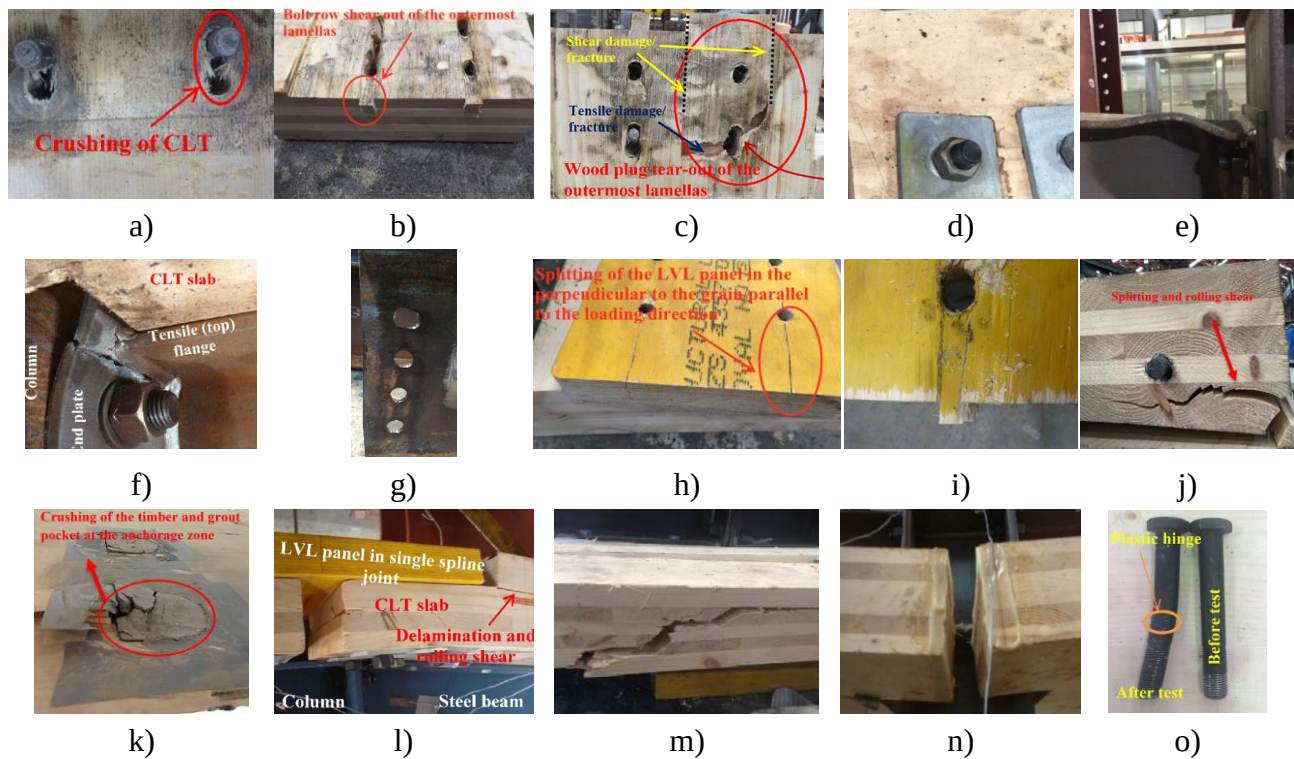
Outstanding failure mechanisms; a) crushing of timber near the bolts, b) row shear of the timber, c) plug shear of the timber, d) crushing of the timber beneath the washers, e) buckling of the steel flange, f) end plate fracture, g) bearing of the beam web, h) splitting of the LVL cover panel, i) row shear of the LVL cover panel, j) splitting and rolling shear of the CLT, k) crushing of the timber and grout pocket at the anchorage zone, l) delamination and rolling shear of the CLT, m) rolling shear of the CLT, n) fracture of the glue, o) plastic hinge on the bolts (10-14).
